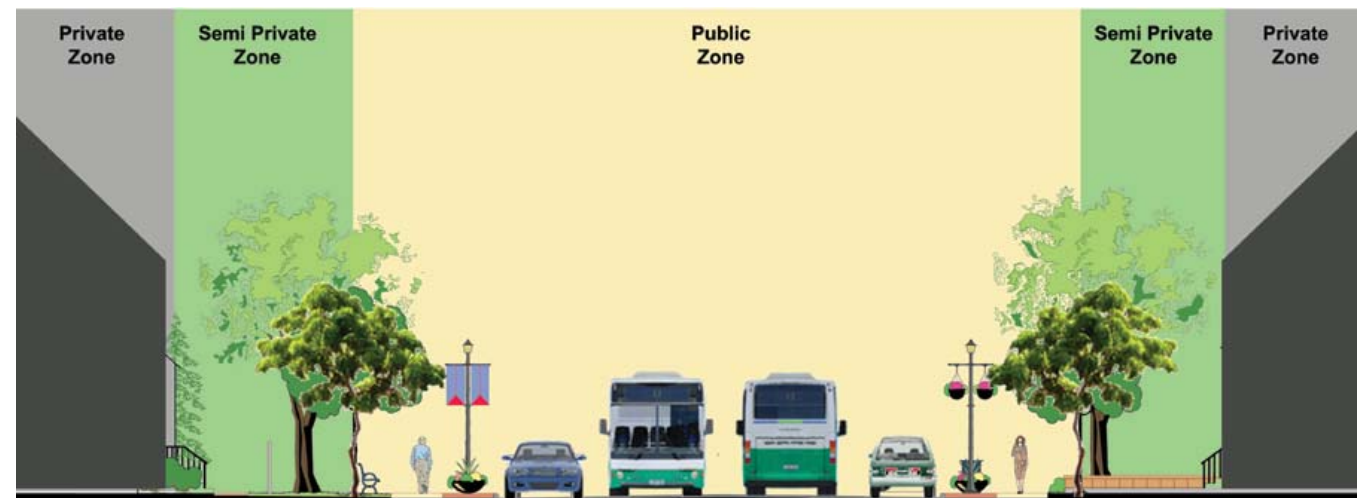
Main Street North Open Space Zones Section, N.T.S.
